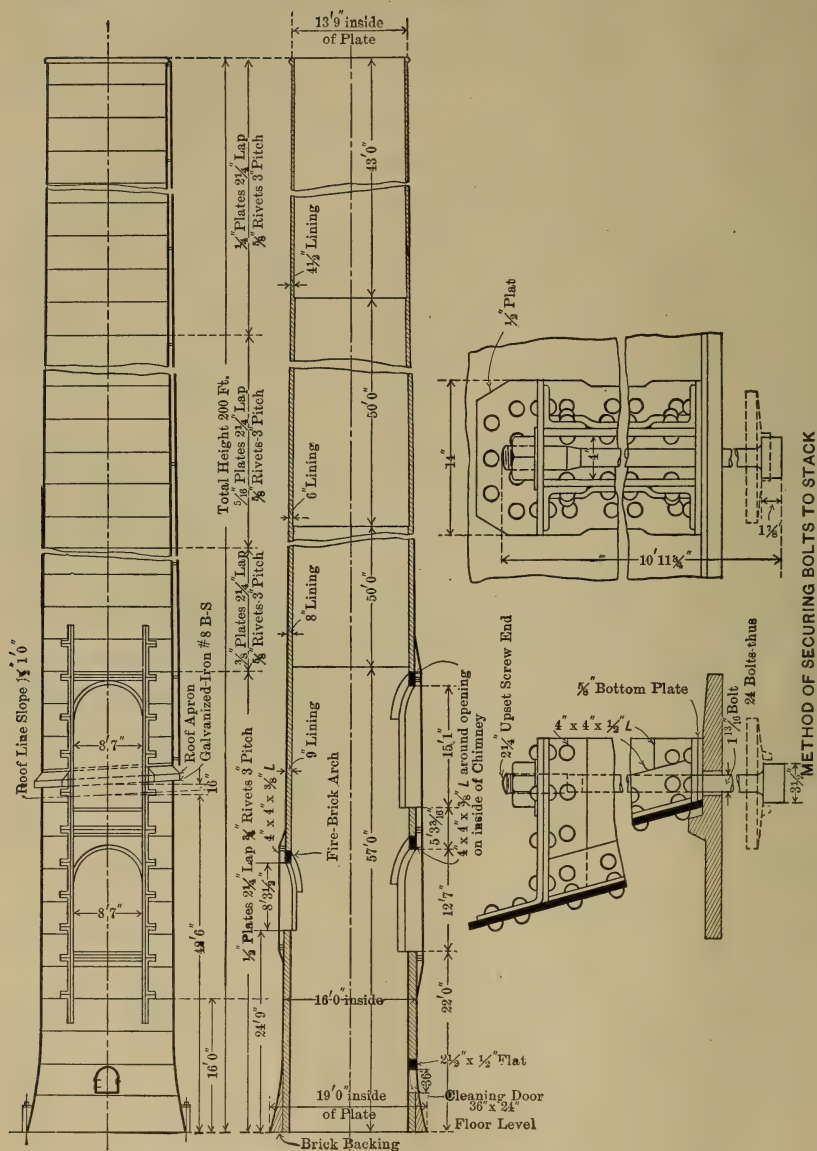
Steel Chimney of the South Side Elevated Railway Power House, Chicago.
